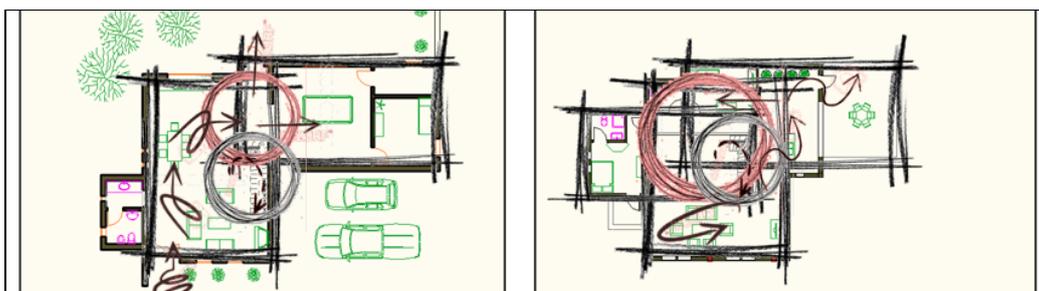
Ground and first floor plans' analysis for the initial design (Source: Author).
